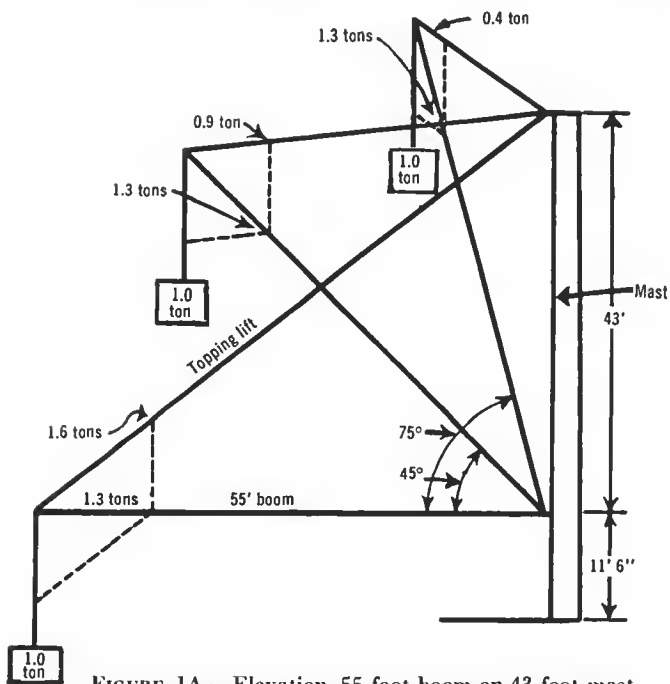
A.—Elevation, 55-foot boom on 43-foot mast.
